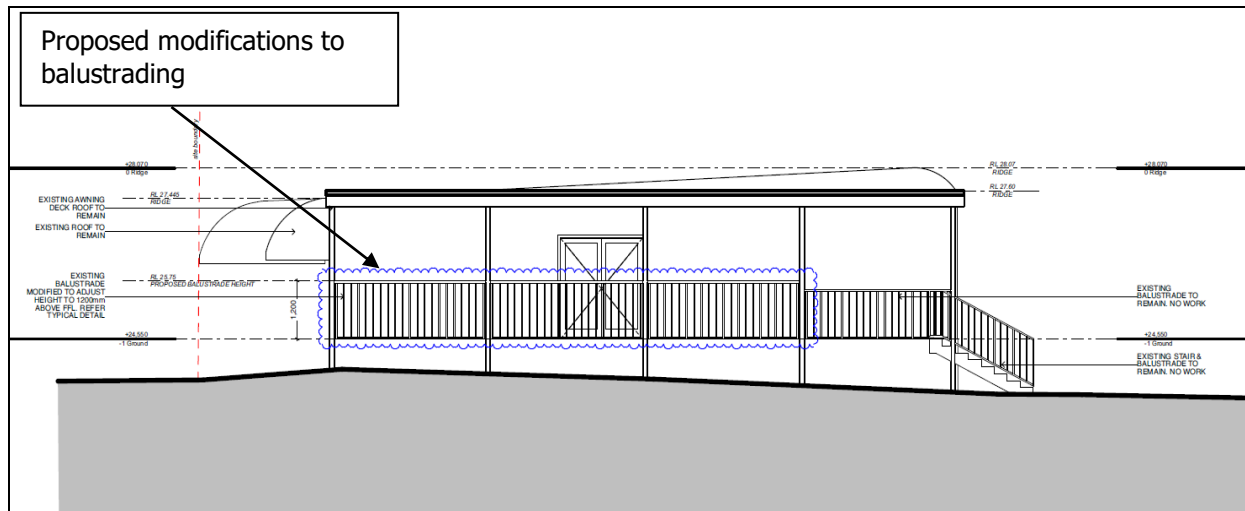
Proposed Eastern Elevation (Interlock Construction, 2020)
